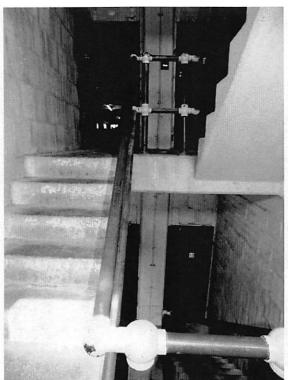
Interior, second floor Units D and E, stairwell, looking west.
